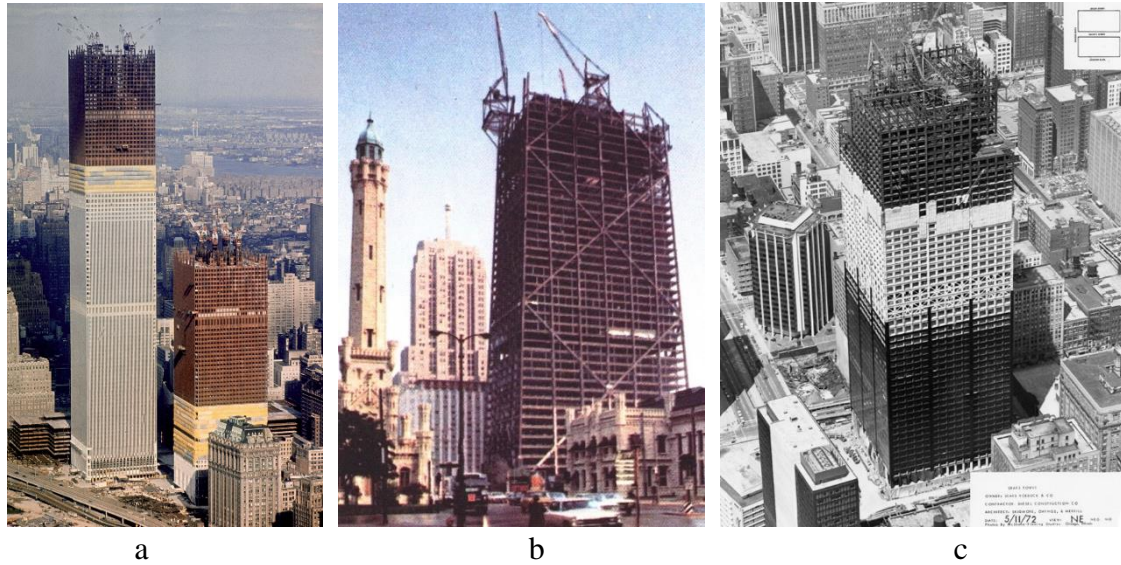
World Trade Center Twin Towers (a) (URL-11), John Hancock Building (b) (URL-12), The Sears Tower (c) (URL-13)
